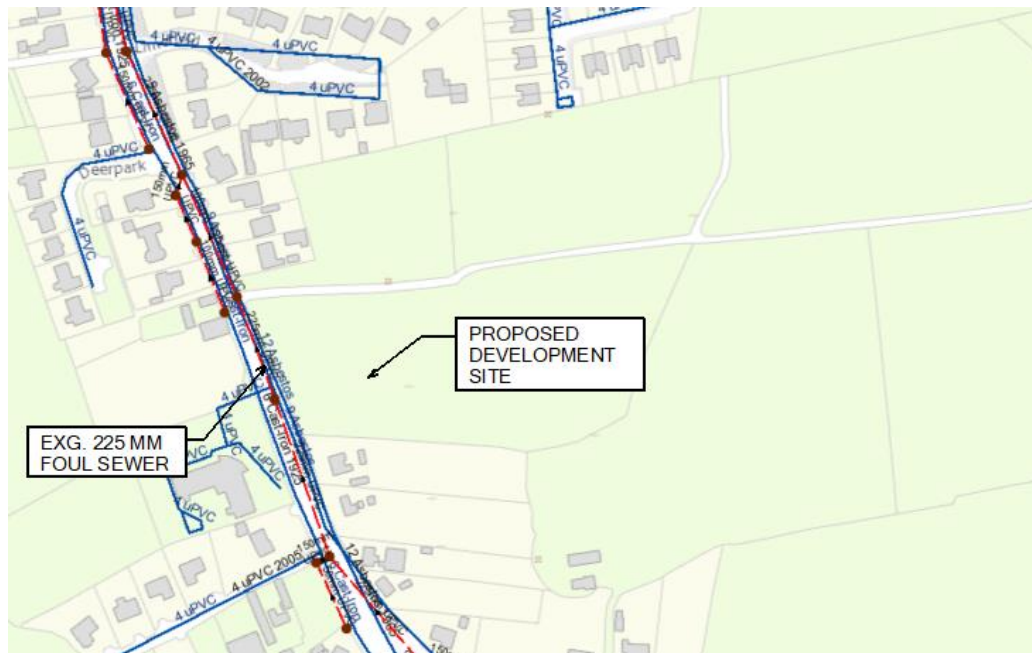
Extract from Irish Water Network Plan – Existing Foul Sewer, Clonminch Road
